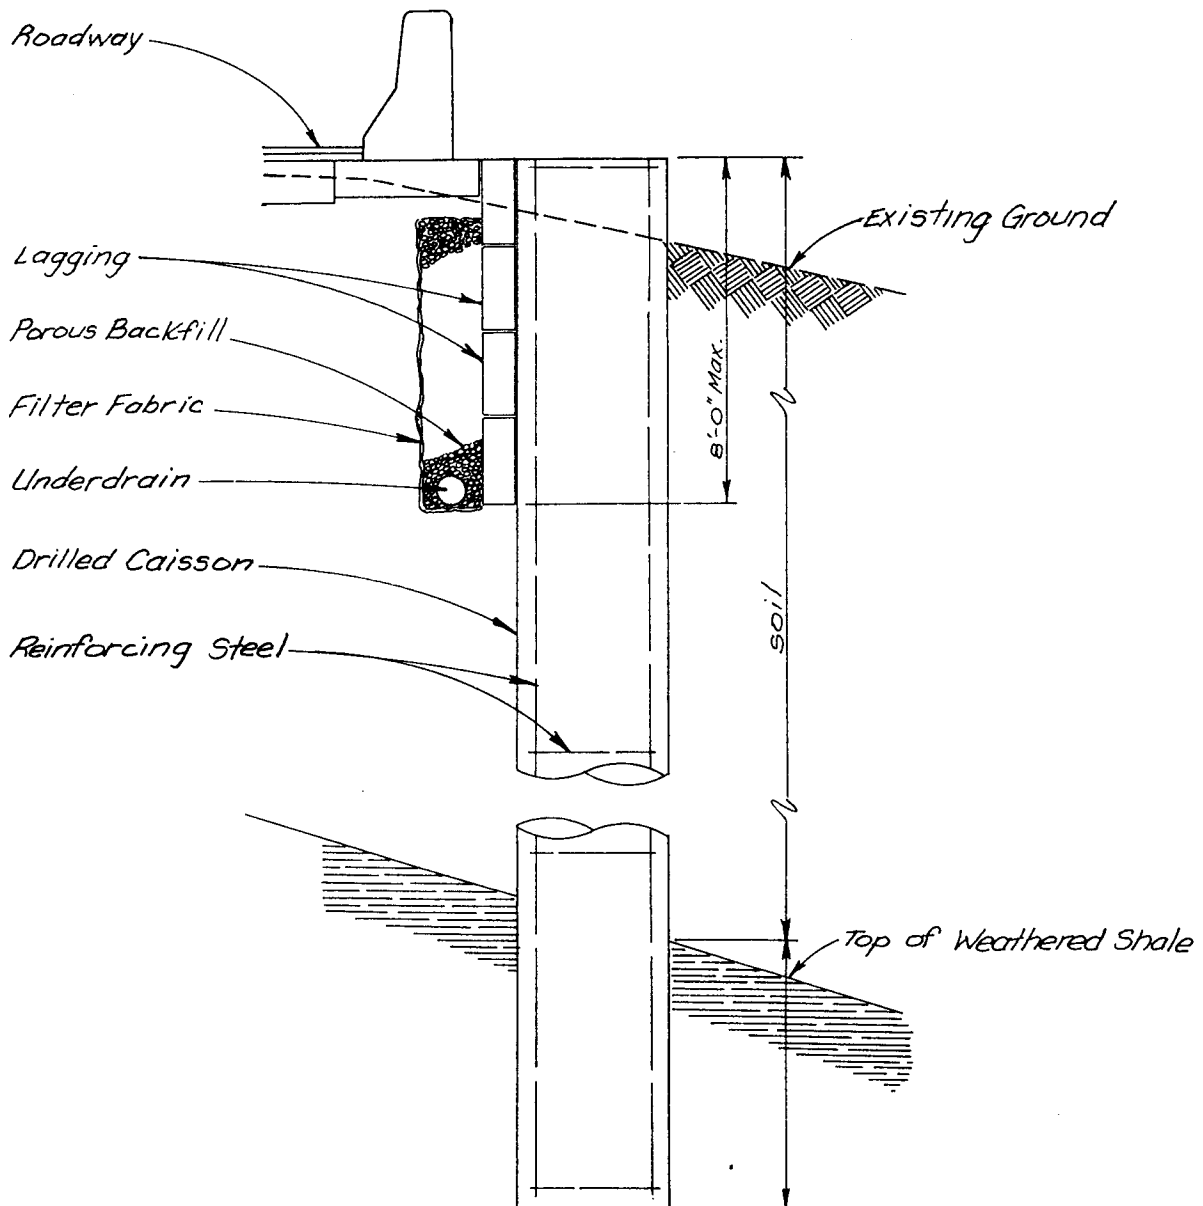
Design of a typical cantilevered pier wall used to support potentially unstable slopes in the Cincinnati area. Pier walls are constructed by drilling large diameter holes into bedrock, which are in turn filled with reinforced concrete. When completed, each pier acts as a lever to prevent the colluvium from moving downslope.
